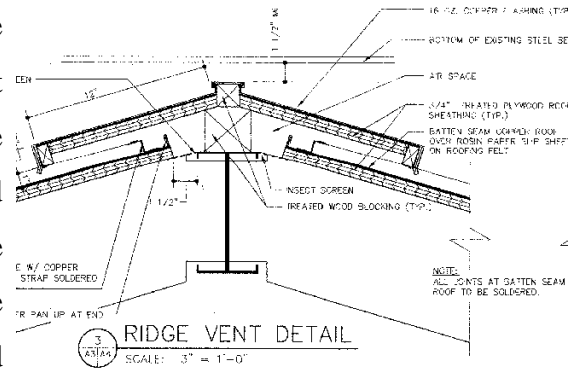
Roofing Felt/Vapor Barrier noted on original construction drawings for control house.
